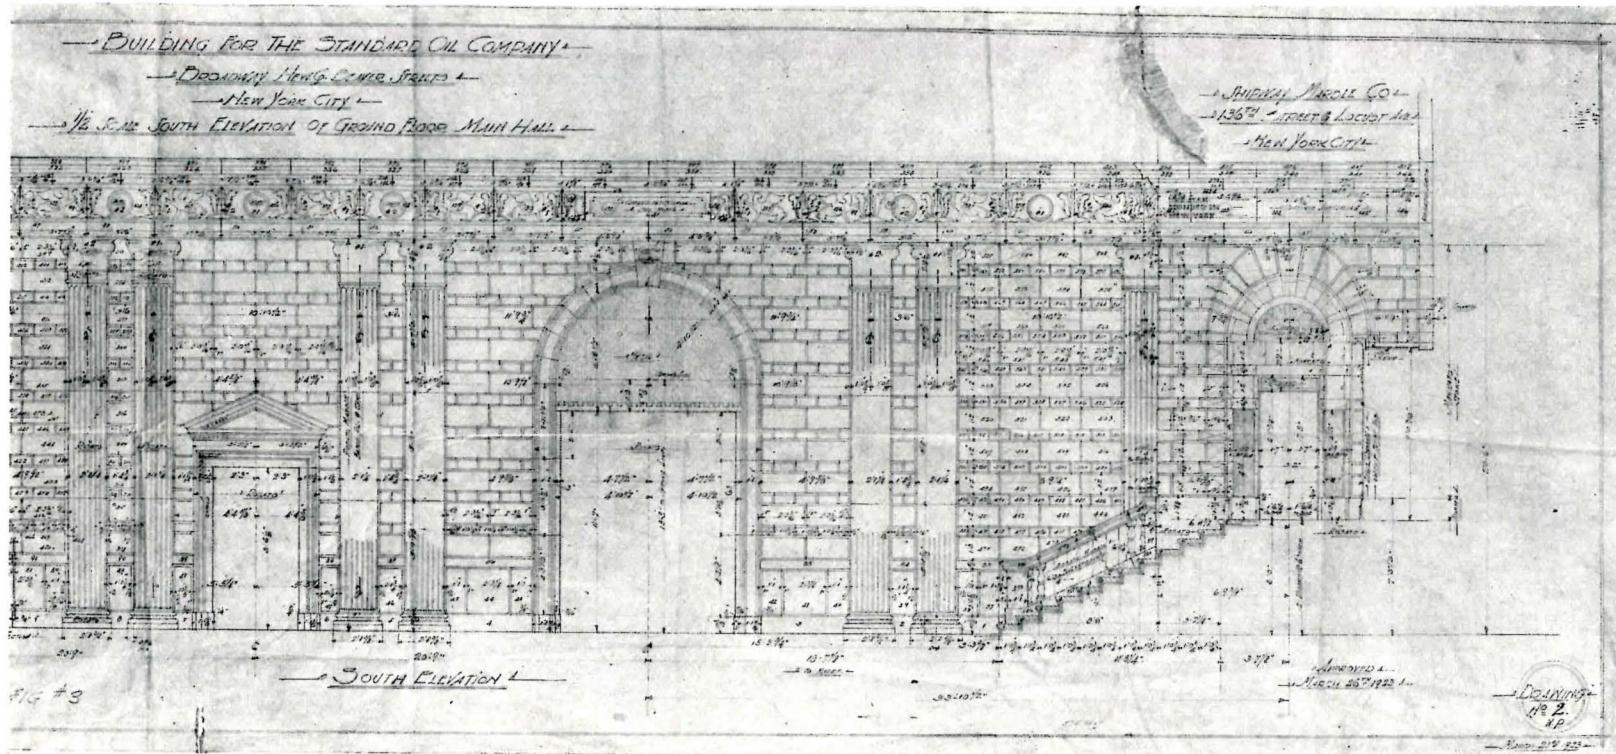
South Elevation, Ground Floor, Main Hall. Building for The Standard Oil Company, New York City. Carrère & Hastings, Architects. Shreve, Lamb & Blake, Associated.
